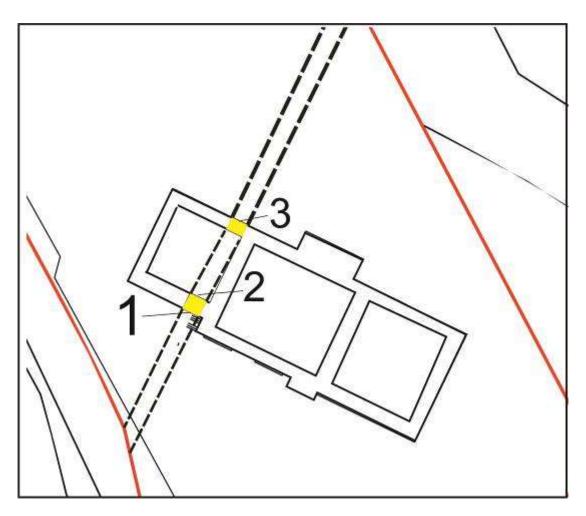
Plan of foundation trenches for new house showing location of excavated and drawn sections across linear cut feature 102.
